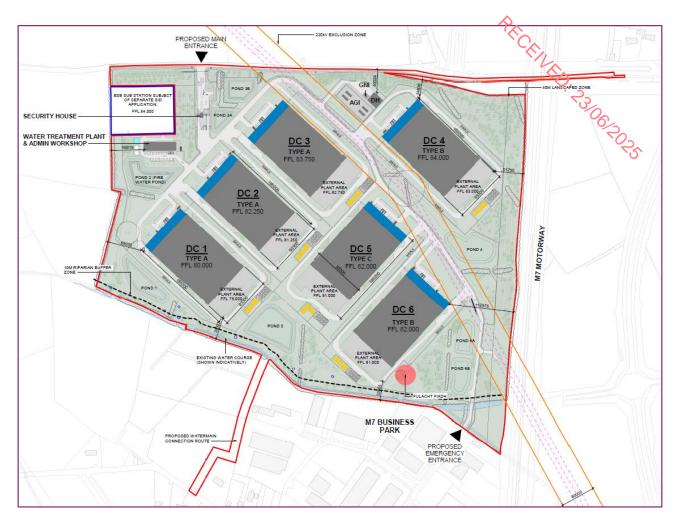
Previously Submitted Overall Proposed Site Plan (extract of submitted drawing 22217-RKD-ZZ-ZZ-DR-A-1010-OVERALL PROPOSED SITE PLAN)
